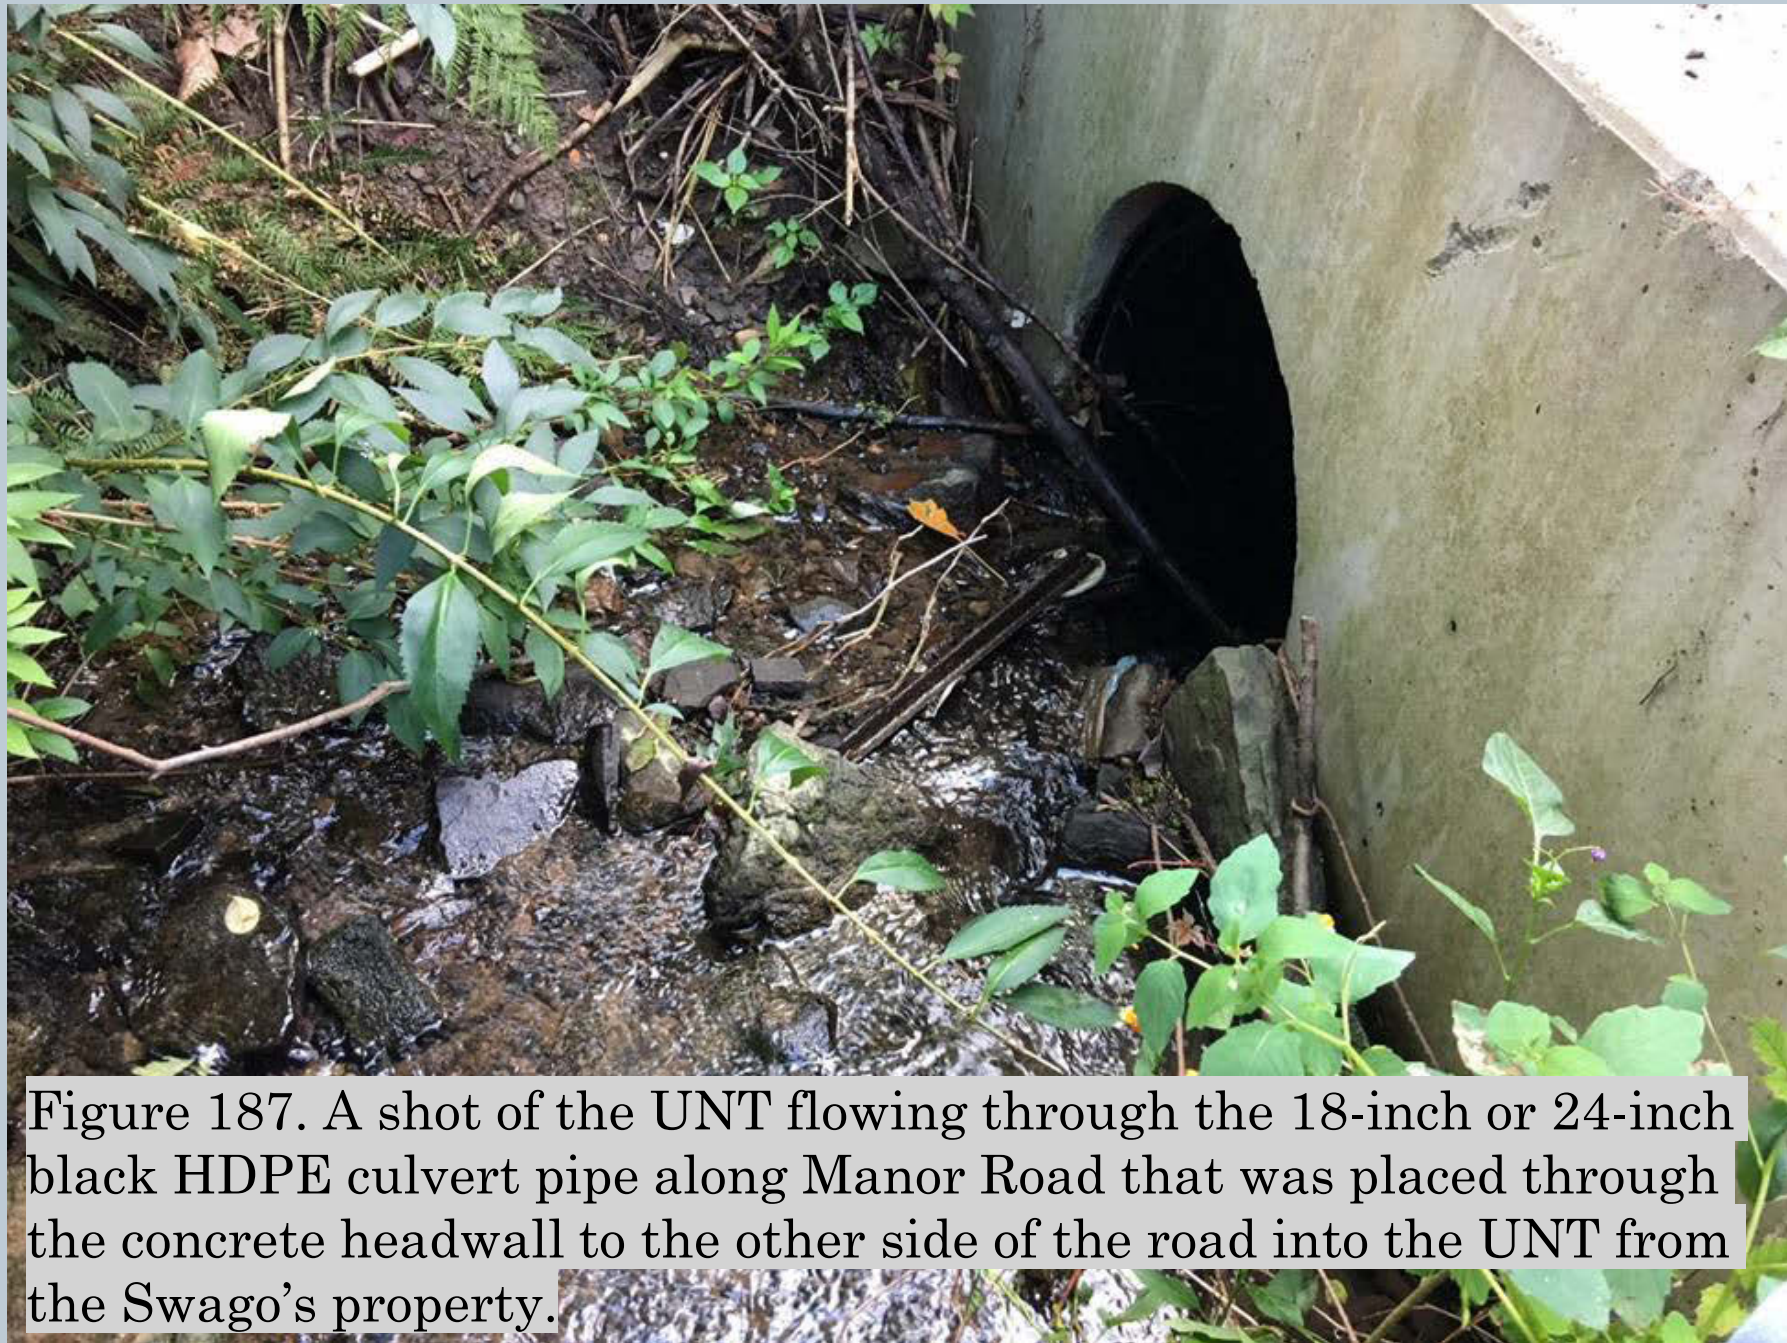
A shot of the UNT flowing through the 18-inch or 24-inch black HDPE culvert pipe along Manor Road that was placed through the concrete headwall to the other side of the road into the UNT from the Swago's property.
